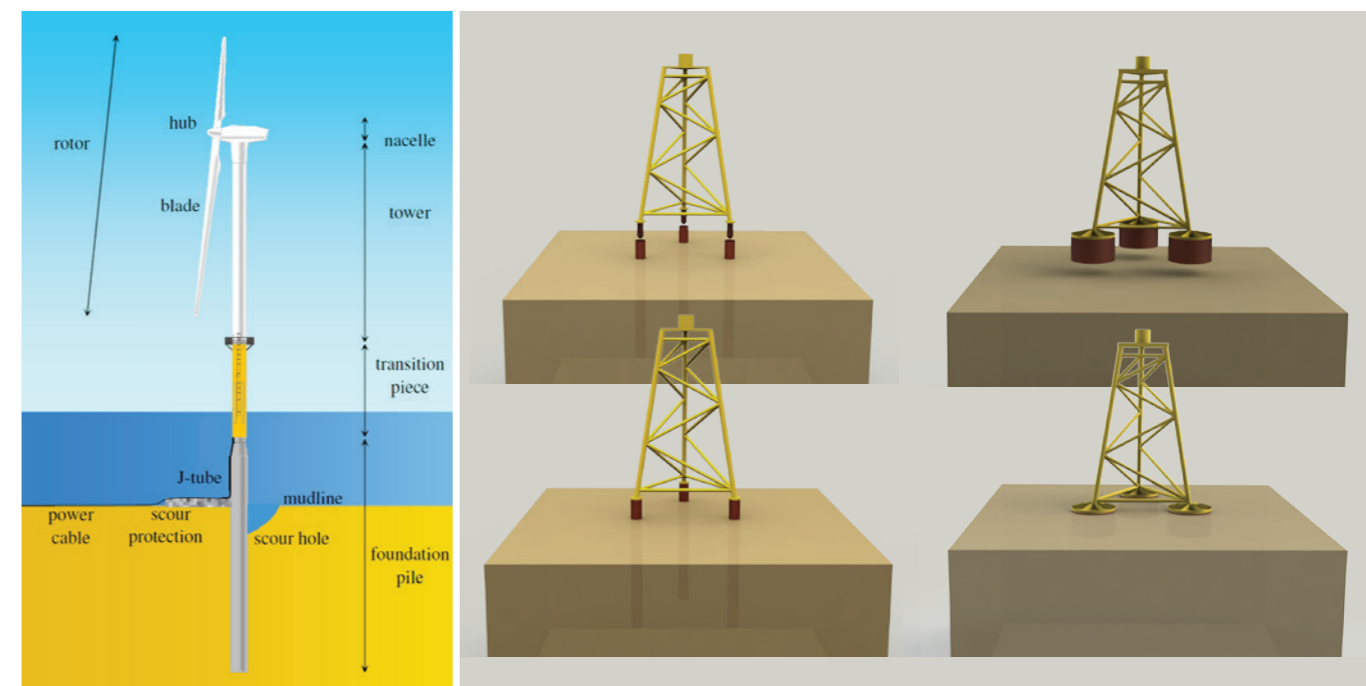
Monopile foundation (left) and tripod jackets with pre-driven piles or suction caissons (right)
